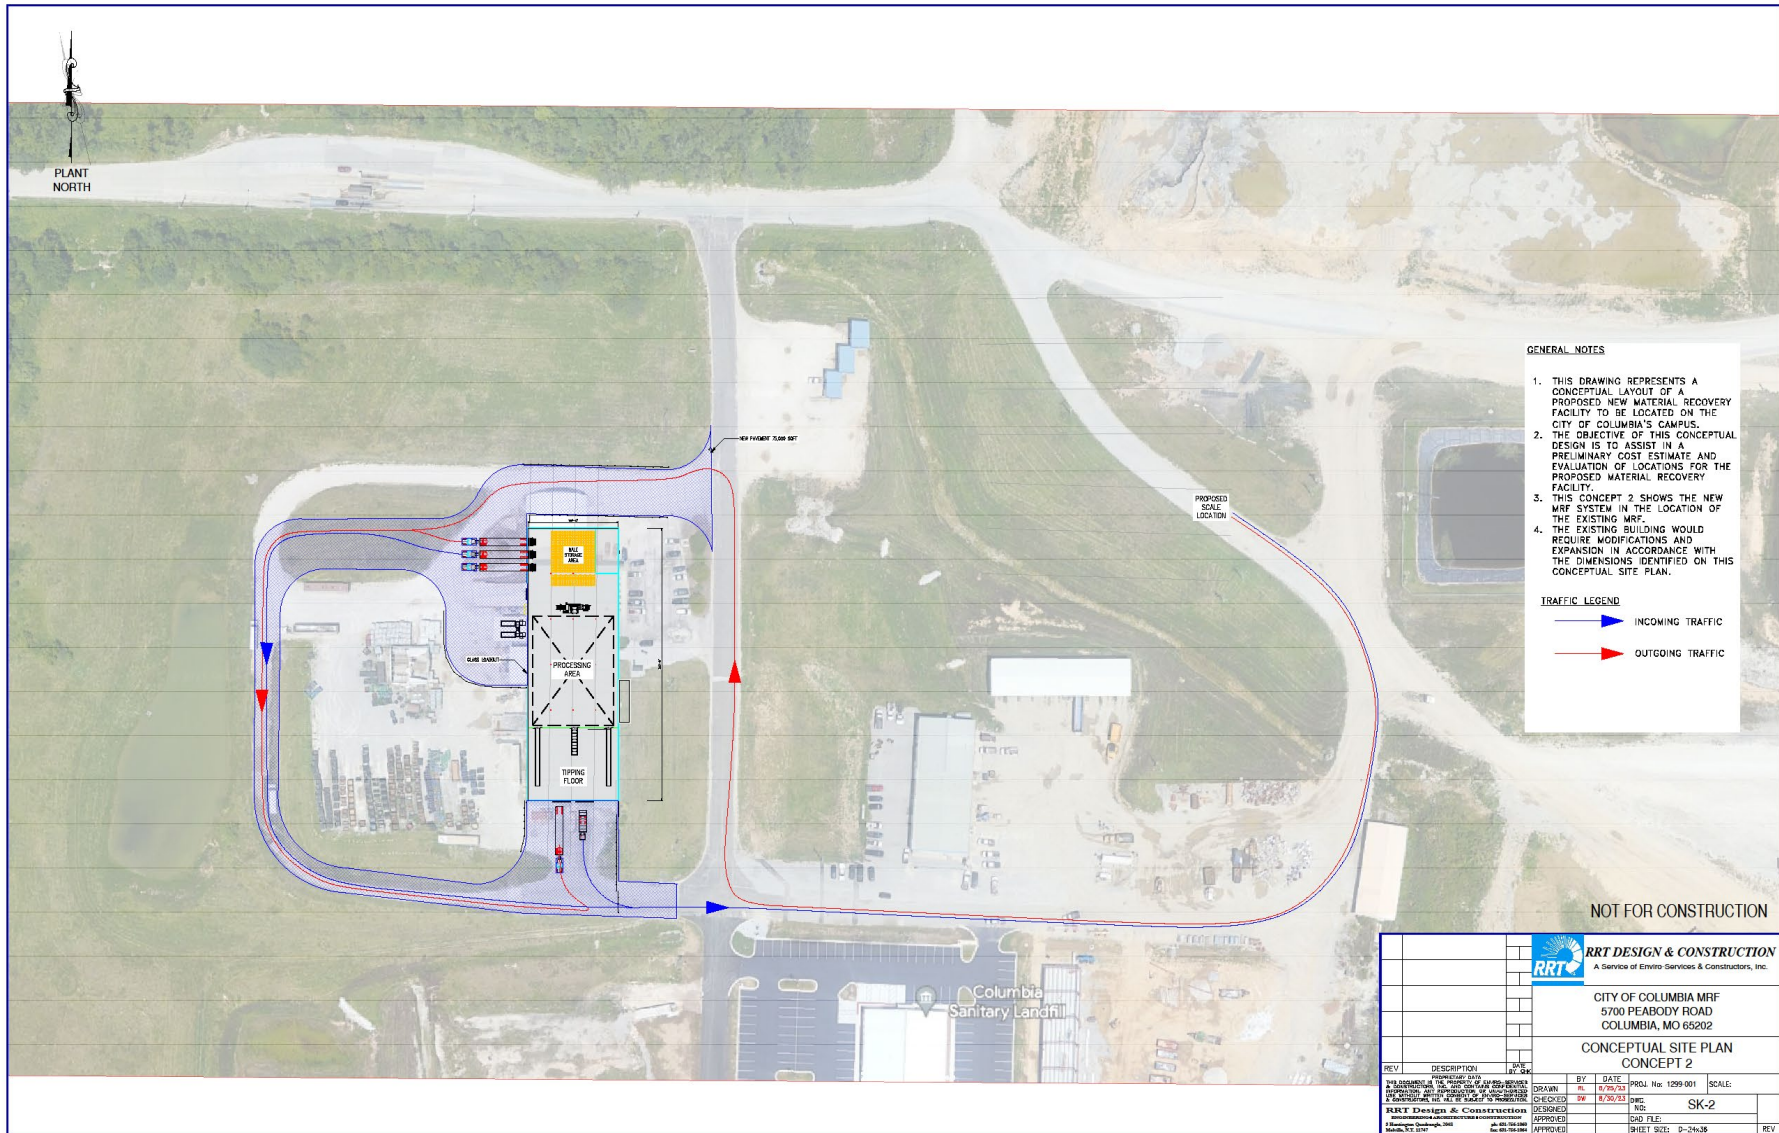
Conceptual Site Plan for New, Larger-Capacity MRF on Existing MRF site
